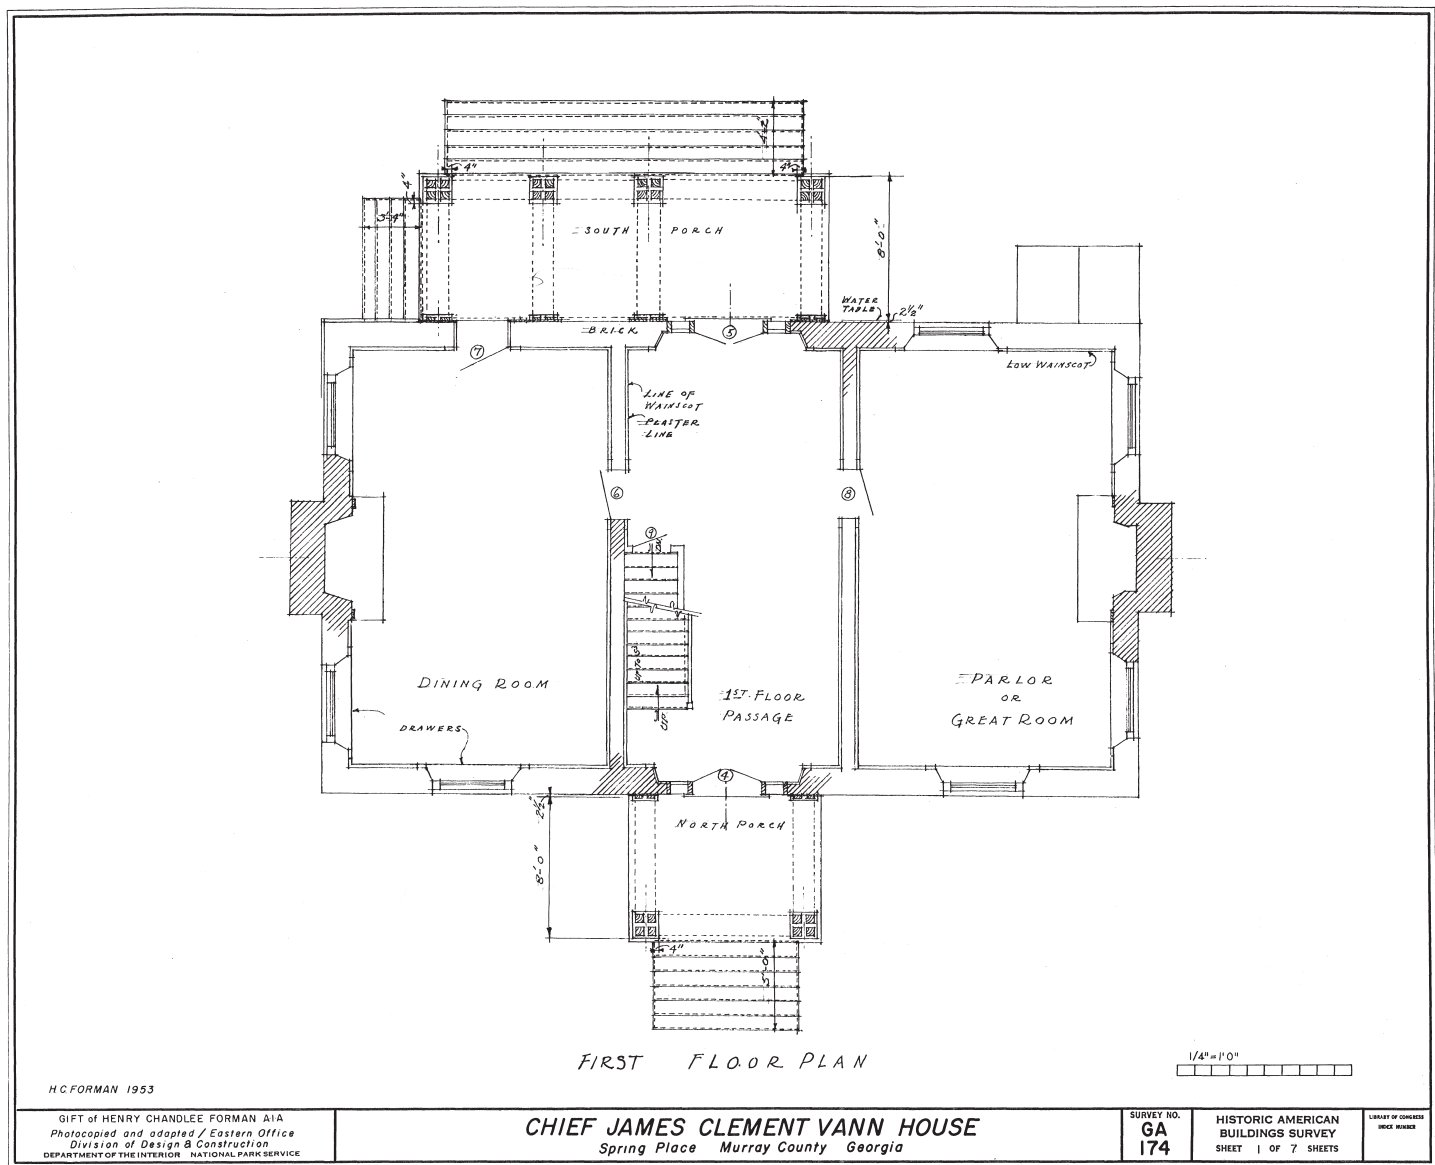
First floor plan (Forman, 1953). LIBRARY OF CONGRESS
